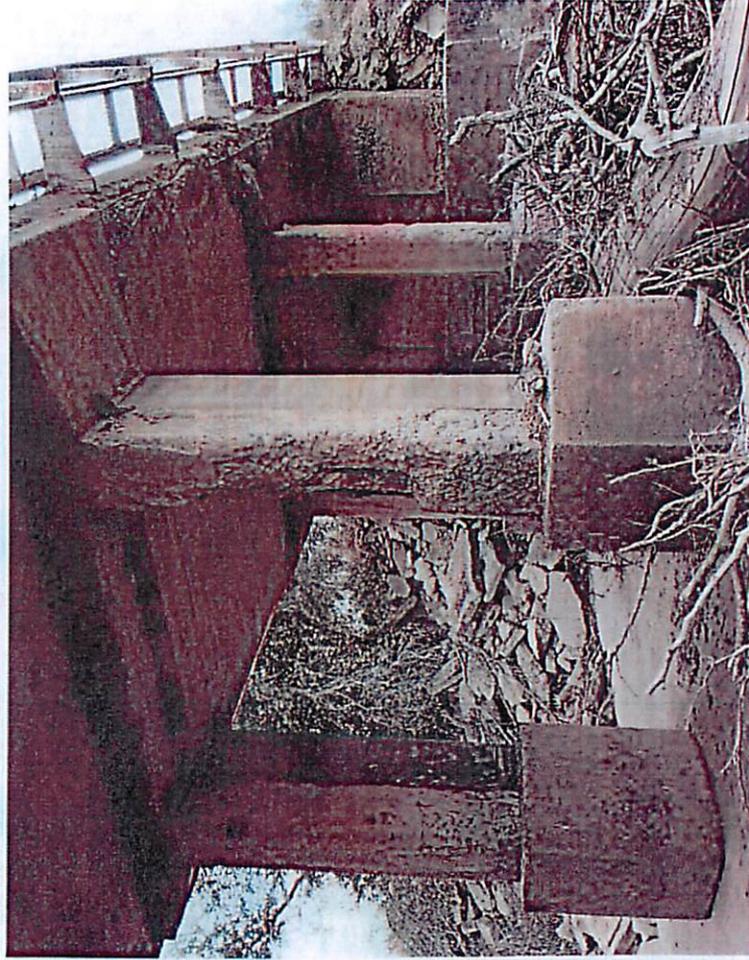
upstream edge of deteriorated deck with exposed reinforcing. Columns at the north pier with exposed / corroded reinforcing and column additions.
